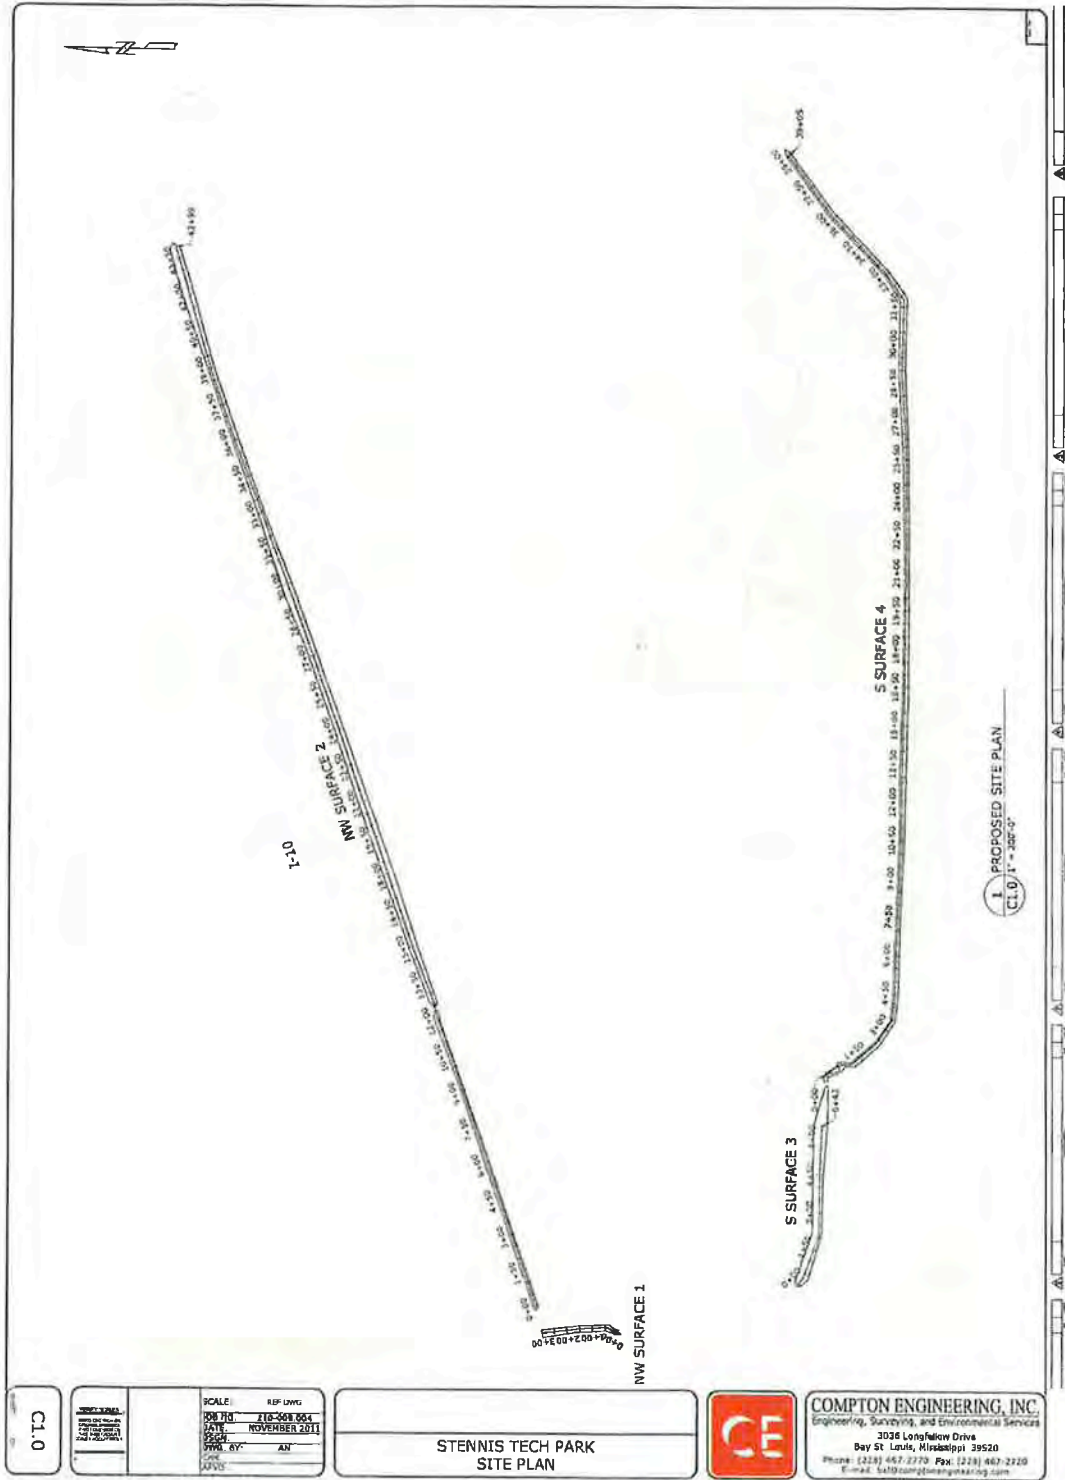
Arrangement of Interpolated Cross-Sections of Excavated/Filled Areas
